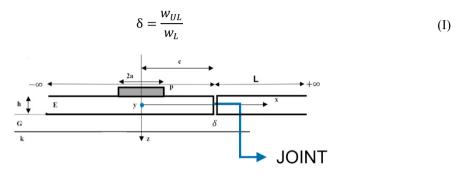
Two semi-infinite jointed slabs on a Pasternak Foundation
